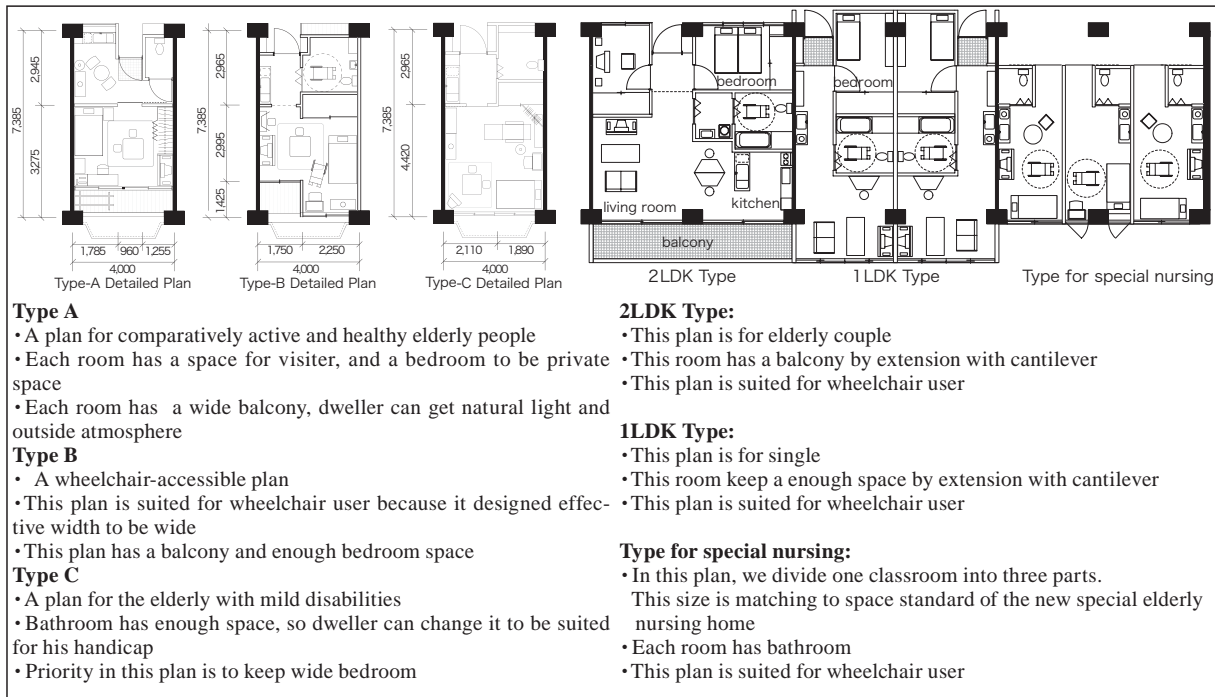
HGN project detail plan: changing classroom unit to dwelling unit
